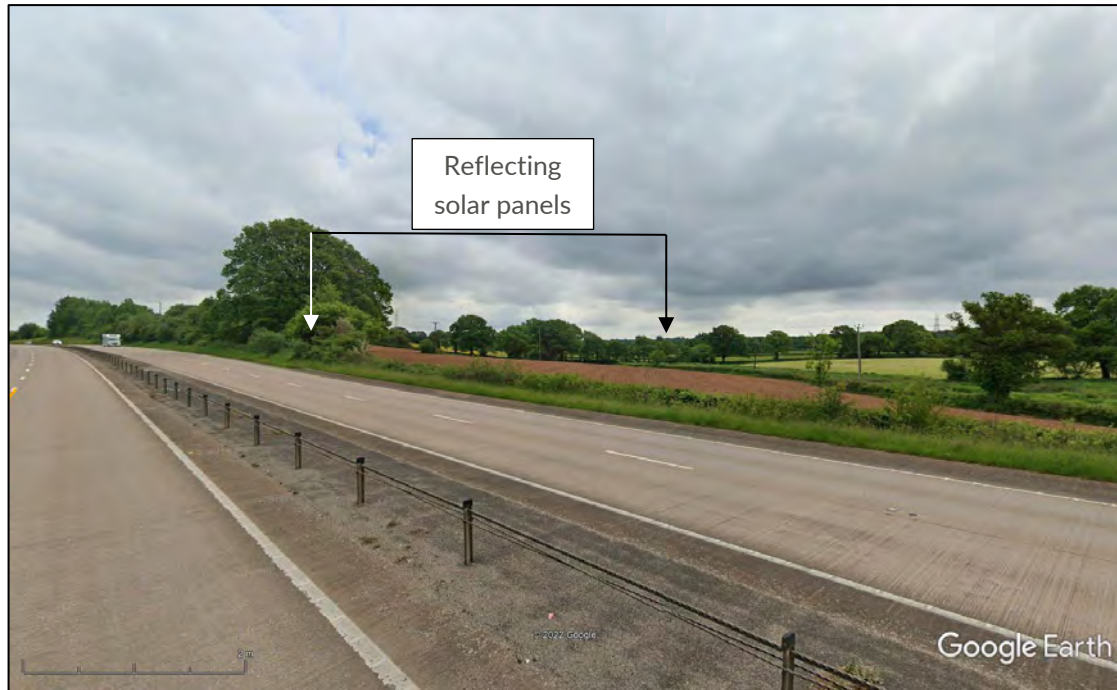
Street view image between location 13 and 14 on the A30 showing where solar reflections would originate within a road user's main field of view were it not for existing screening
